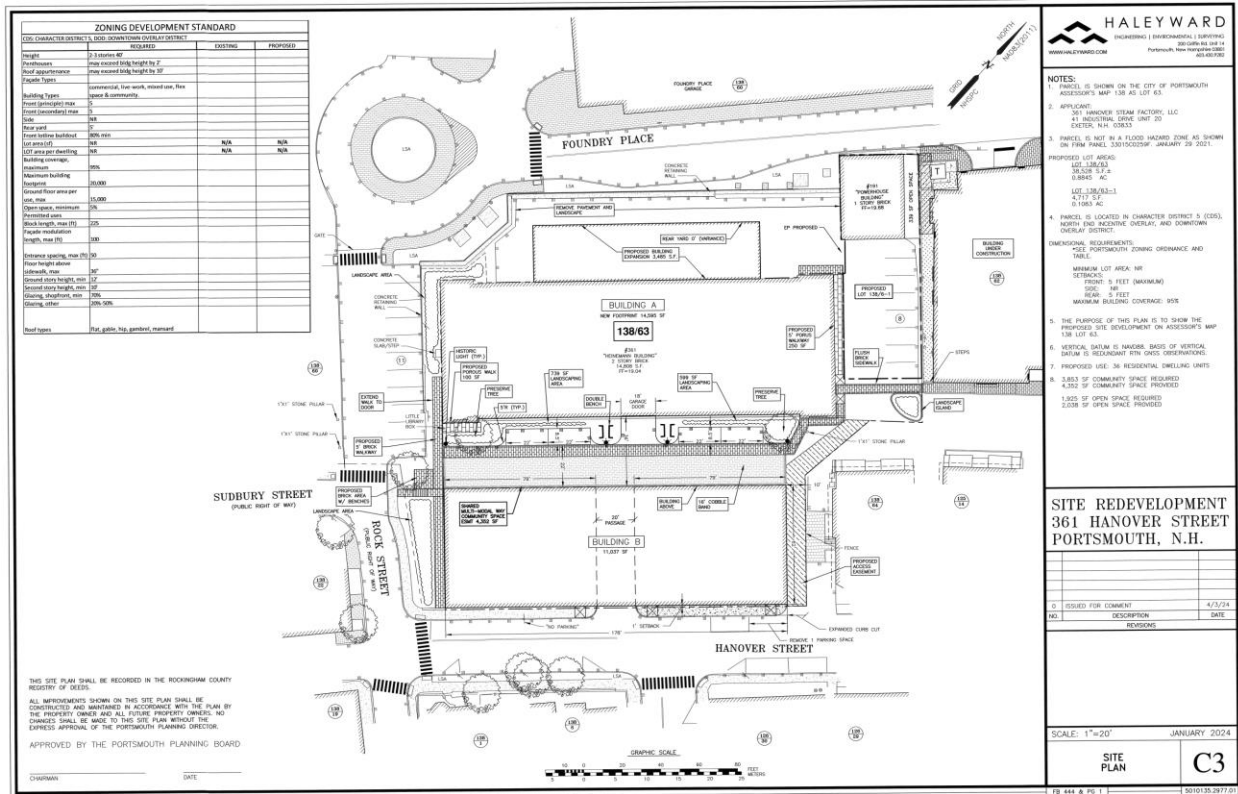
Proposed Site Plan for the Approved, “As-of-Right” Design Review Plan
